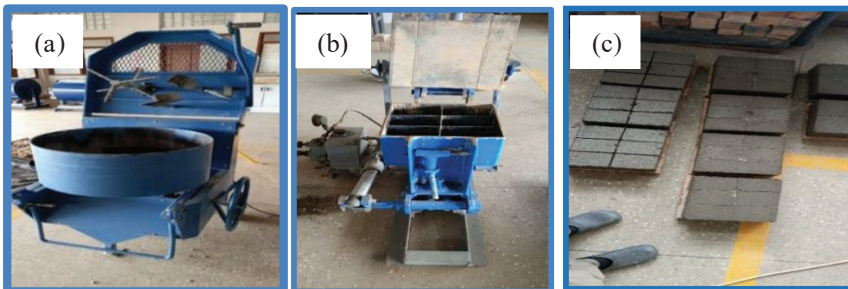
(a) Electric pan mixer, (b) Hydraulic compressed block moulding machine, (c) Specimen Samples
